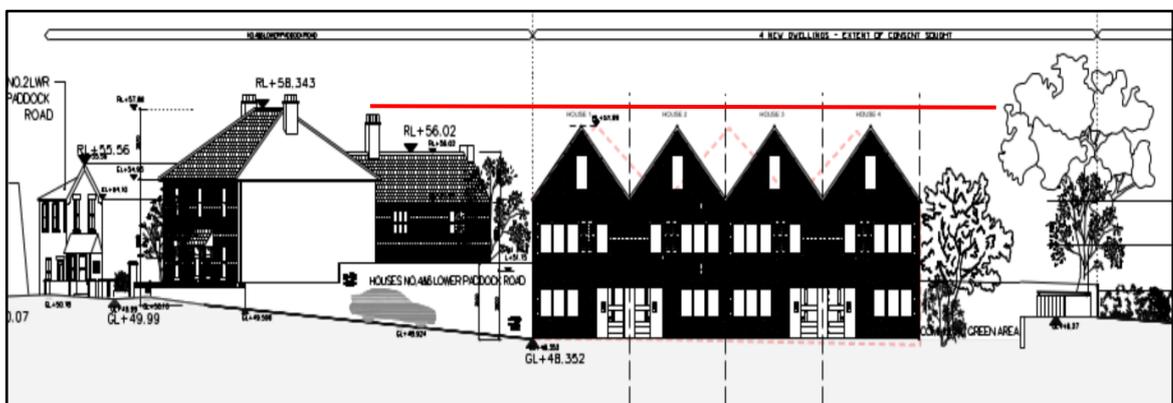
Proposed Elevations and Roof Heights in relationship to No's 4 and 6 Lower Paddock Road
